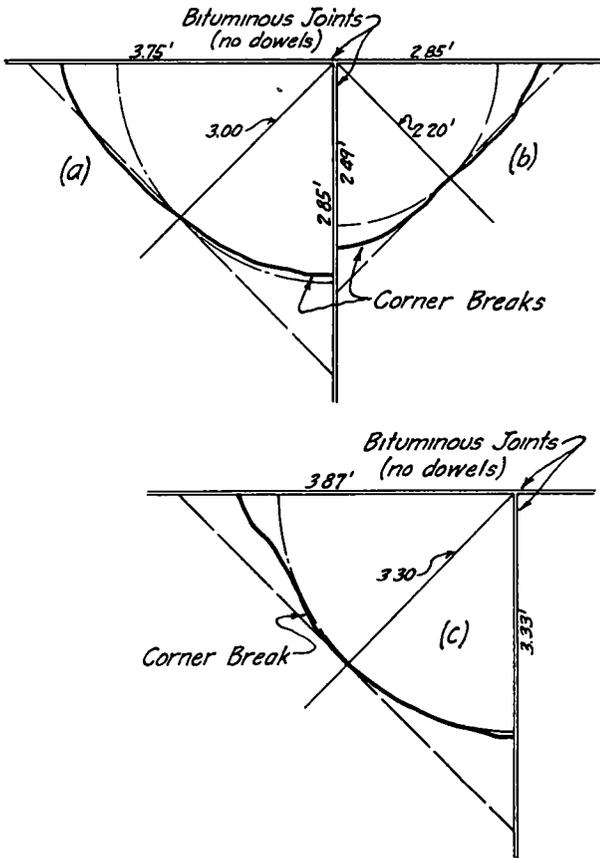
Five-inch Concrete Pavement Reinforced with 6-6-9 wire mesh placed near bottom of slab
